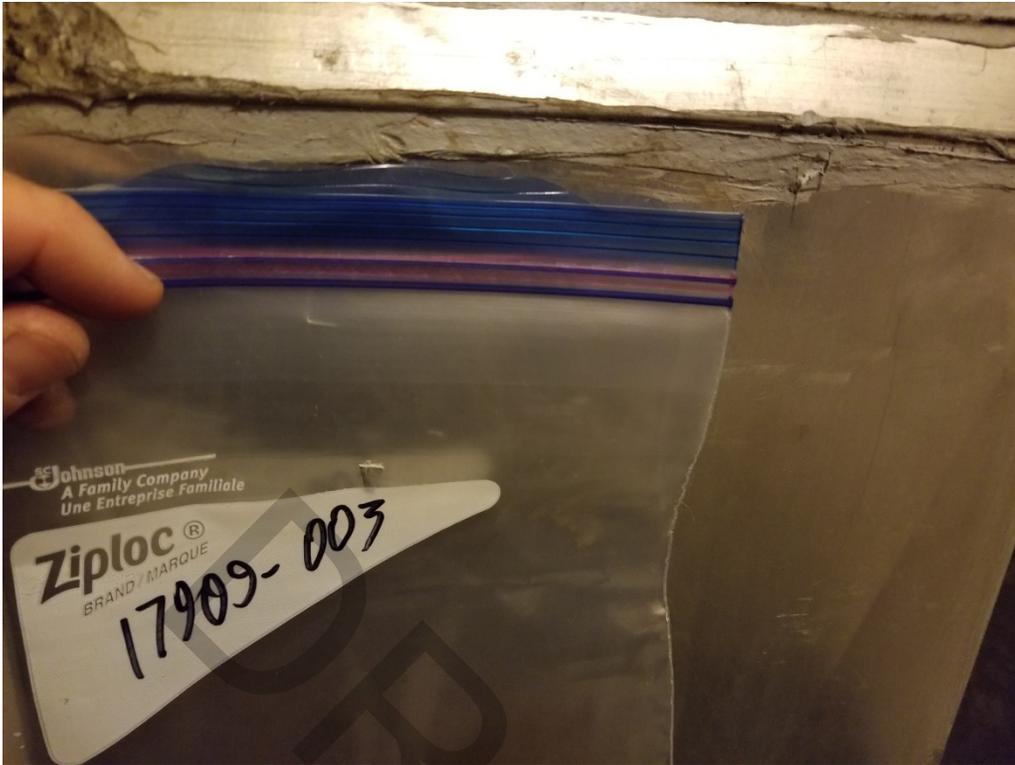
Grey duct sealant is ACM. (May 22, 2018)
